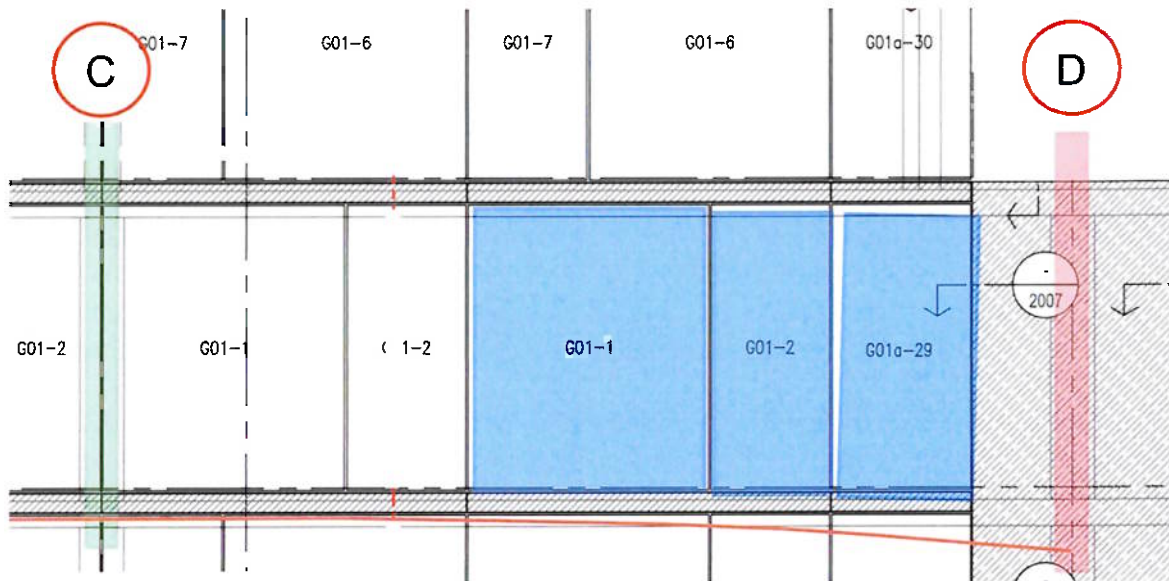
EWS-001 glass rotating due to differential settlement of one column (South elevation)
